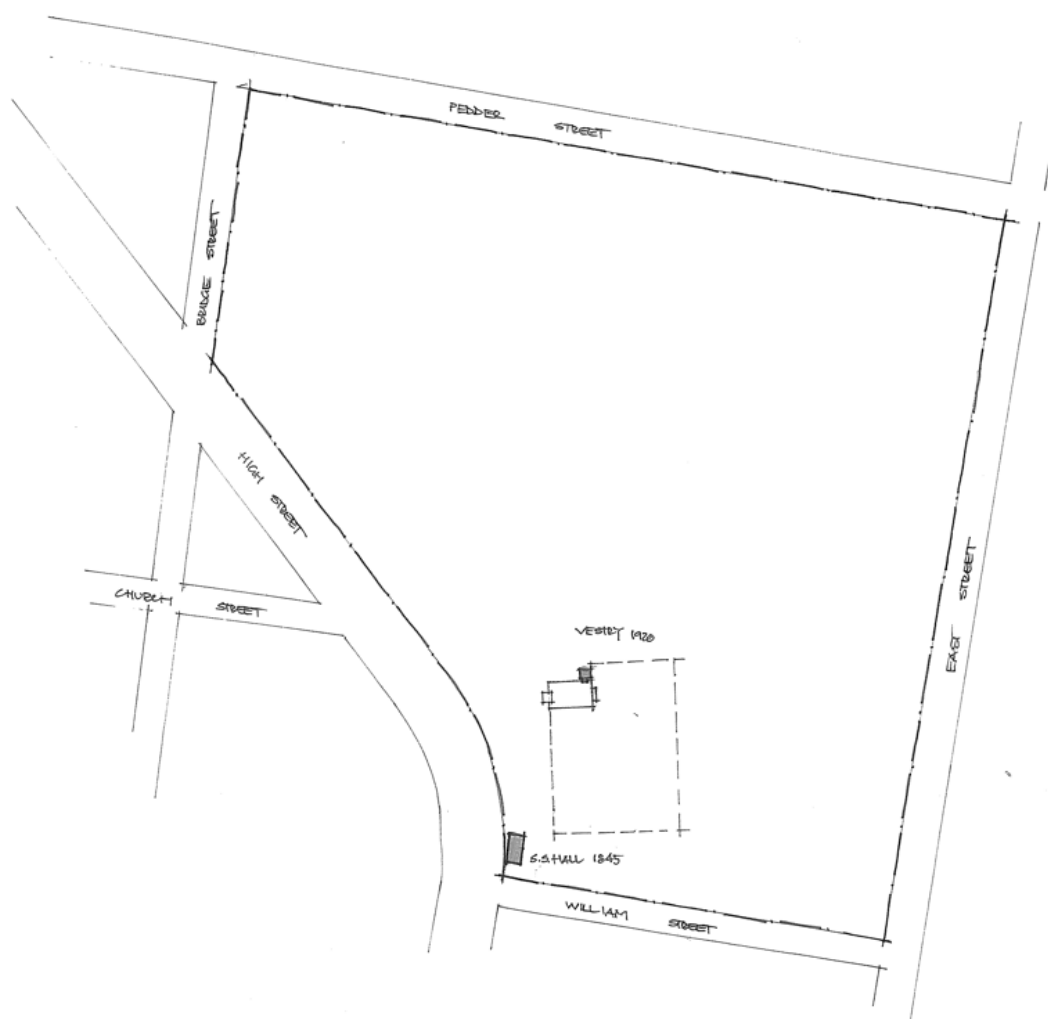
The site in 1920 showing the Sunday School Hall and the vestry addition.
